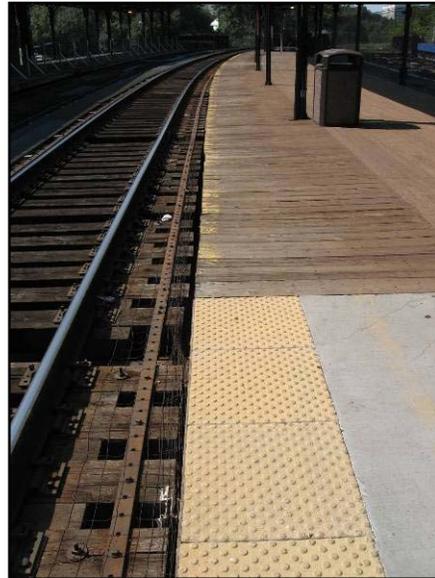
View along Central Platform showing Rail Ties and Wire Mesh Enclosure
